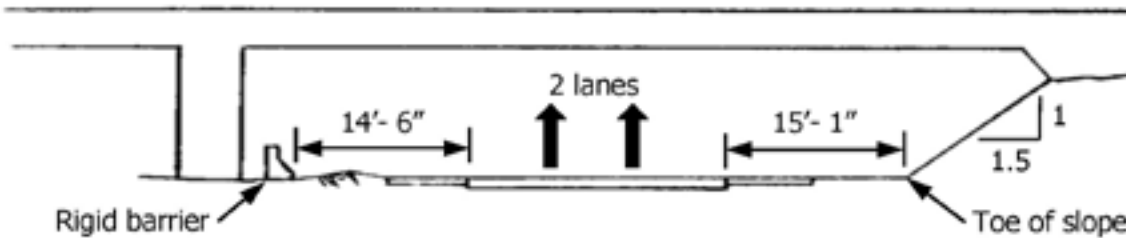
Bridge elevation view of horizontal clearances for a 2-lane, 1-way highway feature below the bridge, with a rigid barrier.
